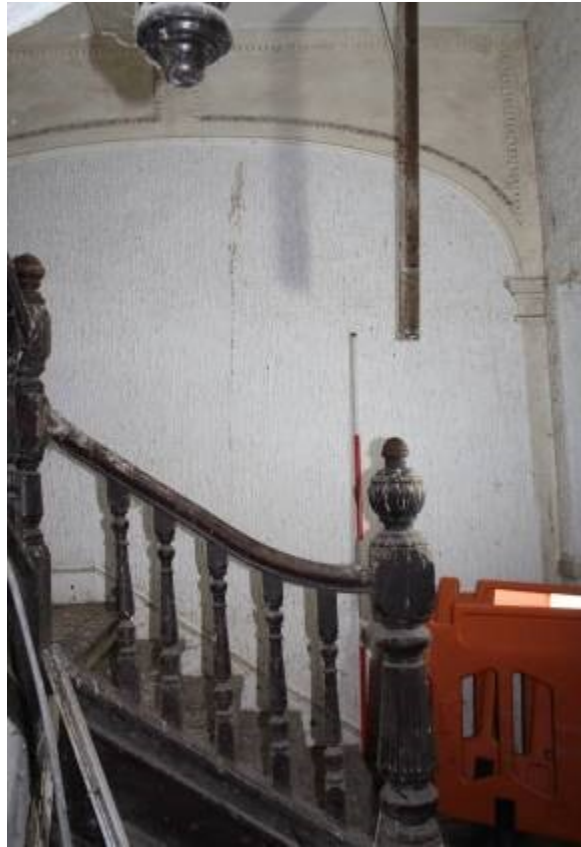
Southwest facing shot of the foot of the main staircase with the infilled archway behind. 2m scale.
